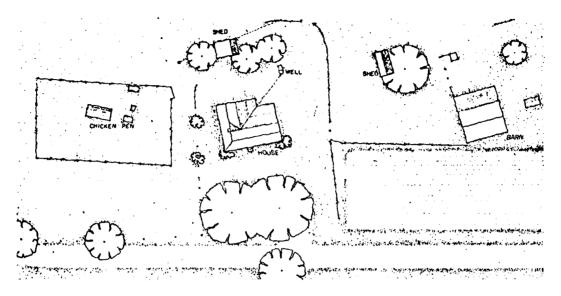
Farmstead layout, R. G. Adams farm, Bay Springs Tract 700, five miles southwest of Paden, Tishomingo County, Mississippi. HABS drawing.
